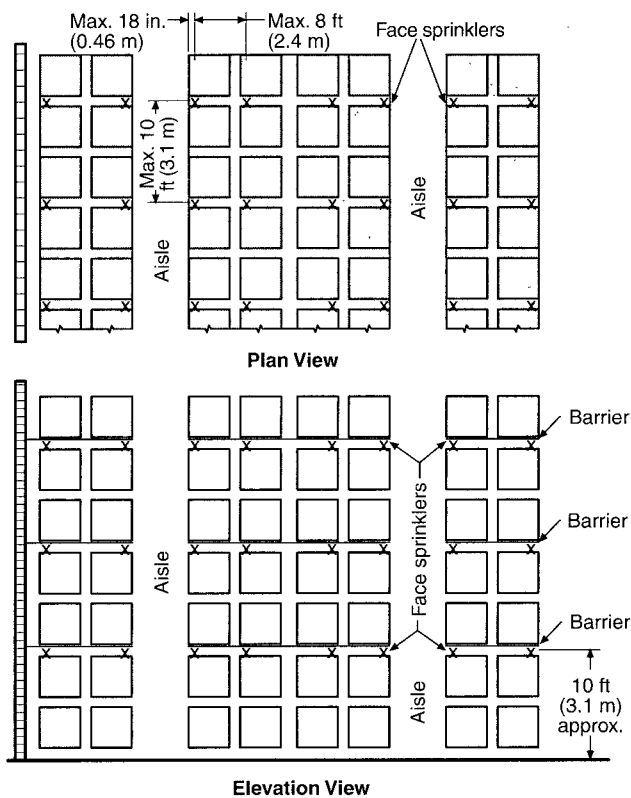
(a)* In-rack sprinkler arrangement, multiple-row racks, cartoned plastic and exposed unexpanded plastic, storage height over 25 ft (7.6 m).
